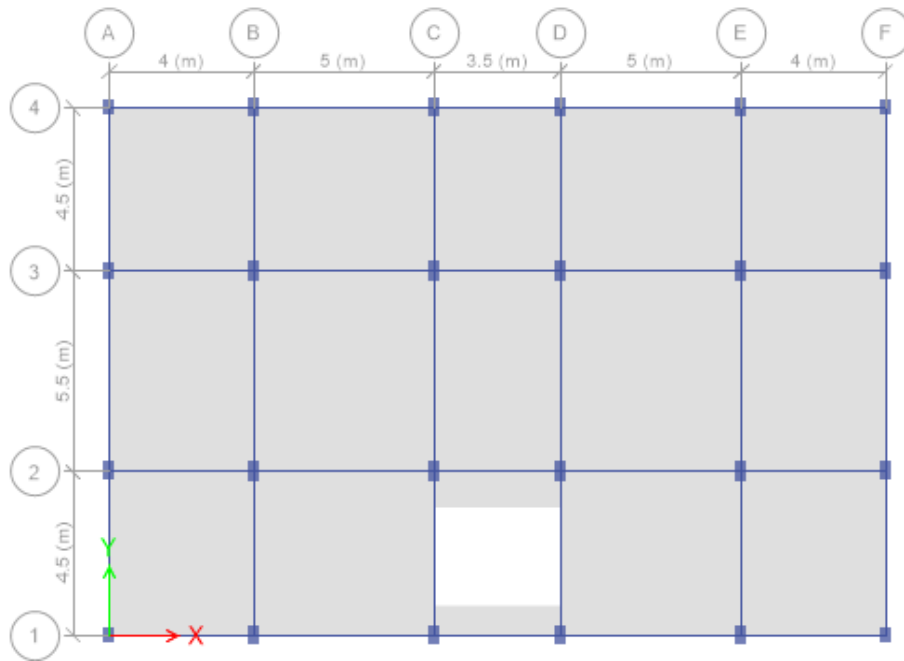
Floor plan for five story moment-resisting frame by ETABS
